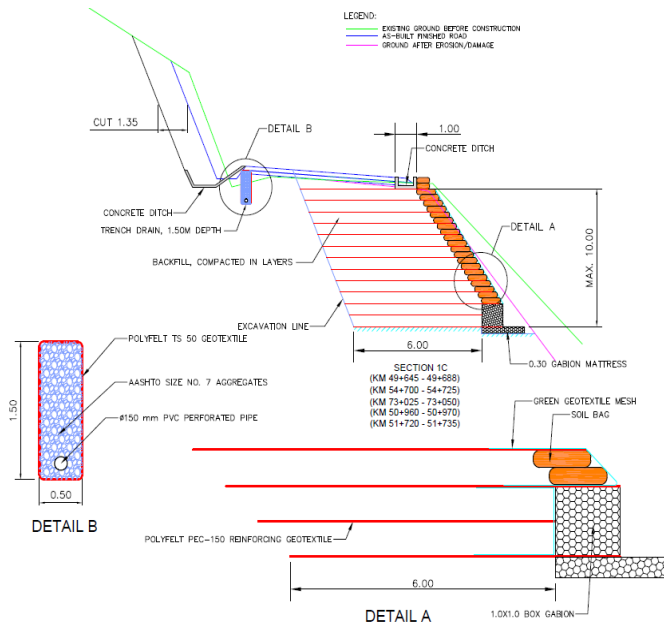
Road embankment failure and internal erosion remedial works at KM 49 to 50 (Case 1).
